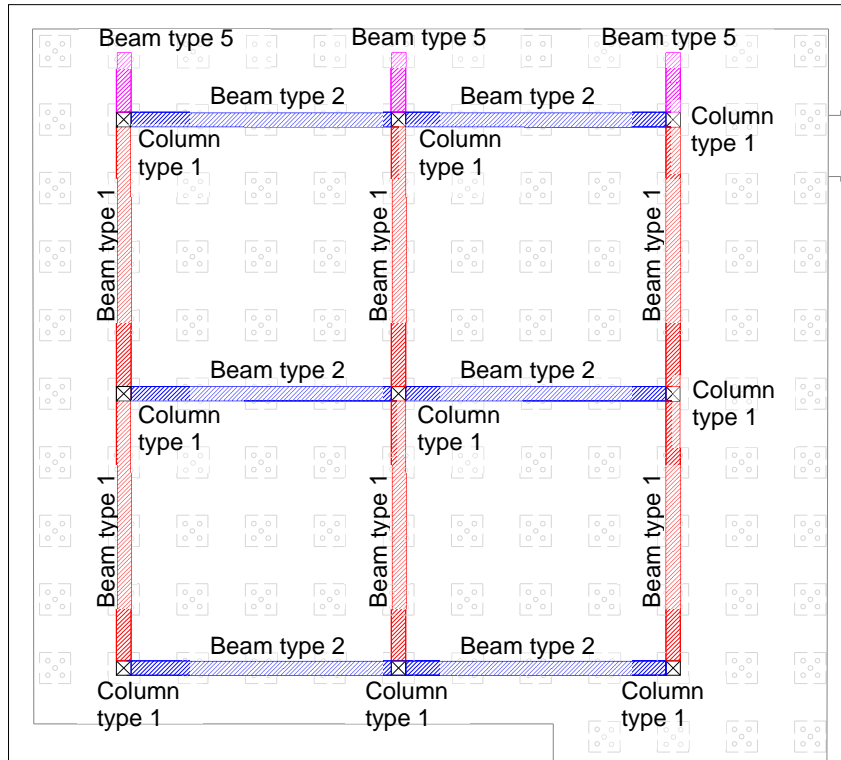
Steel profiles for the symmetric full-scale specimen
